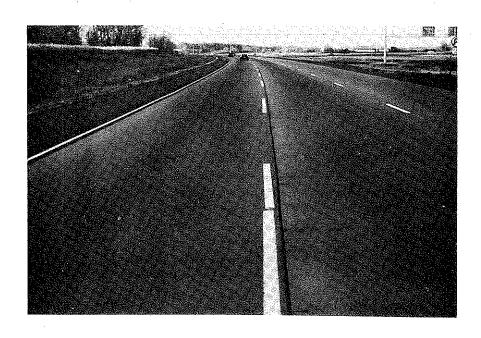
ETP on Portland Cement Concrete Pavement (I-35 Minnesota)
